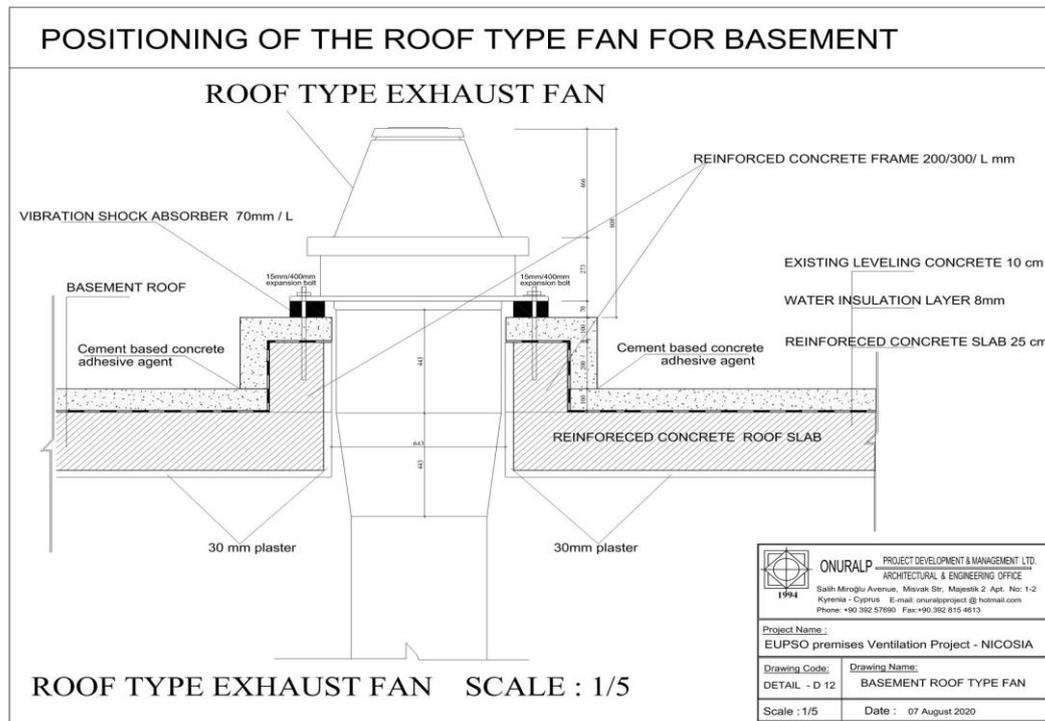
Roof Type Exhaust Fan Detail with Basement Roof Slab – EUPS0 project detail no:12
